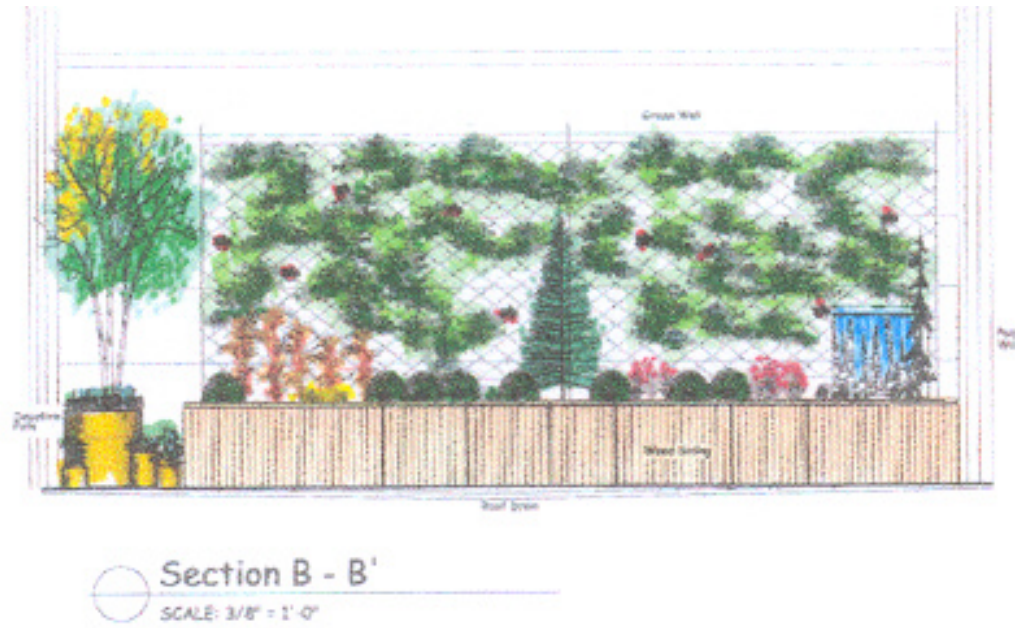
Plant trellises (Green Walls) on cross elevation of wall opposite
